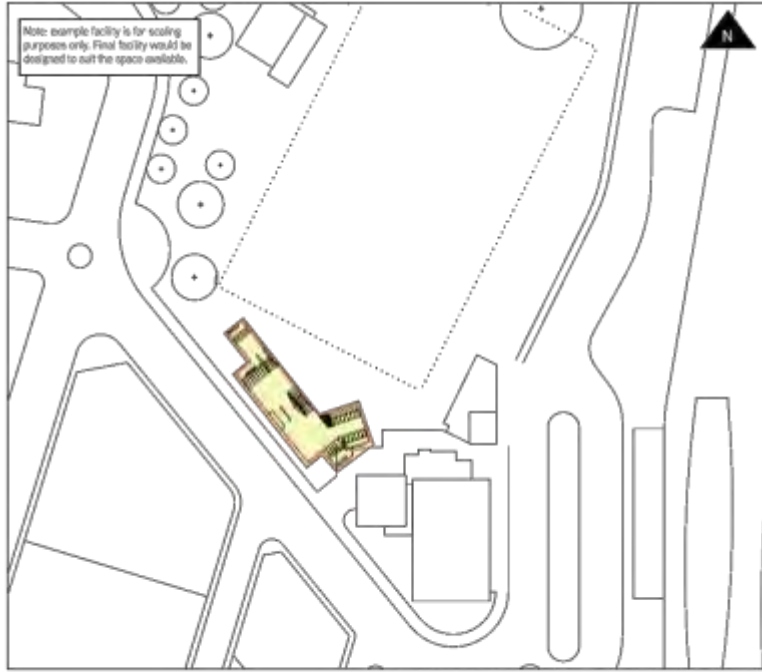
| Indicative overlay of local facility - Cedric Archer, WA (size 431sqm)
